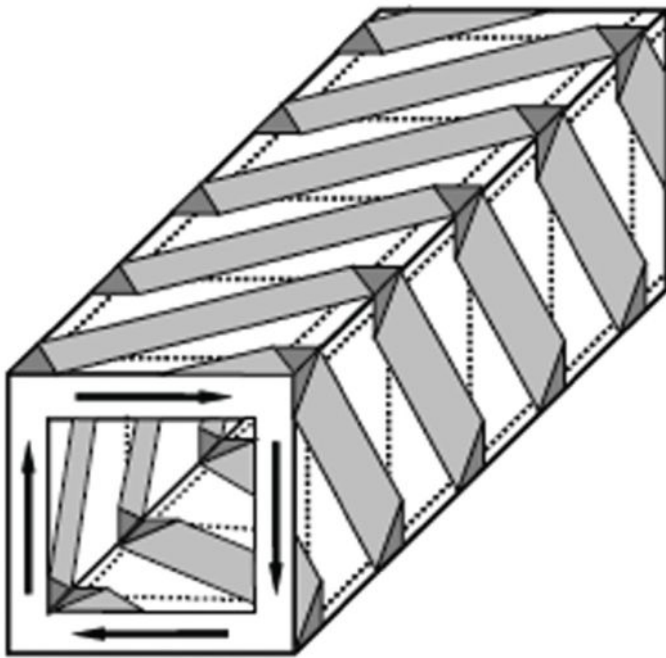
Strut-and-tie model of a space truss subjected to a torsional moment. Source: *Anchorage of Headed Reinforcement in CCT Nodes*.<sup>2</sup>
